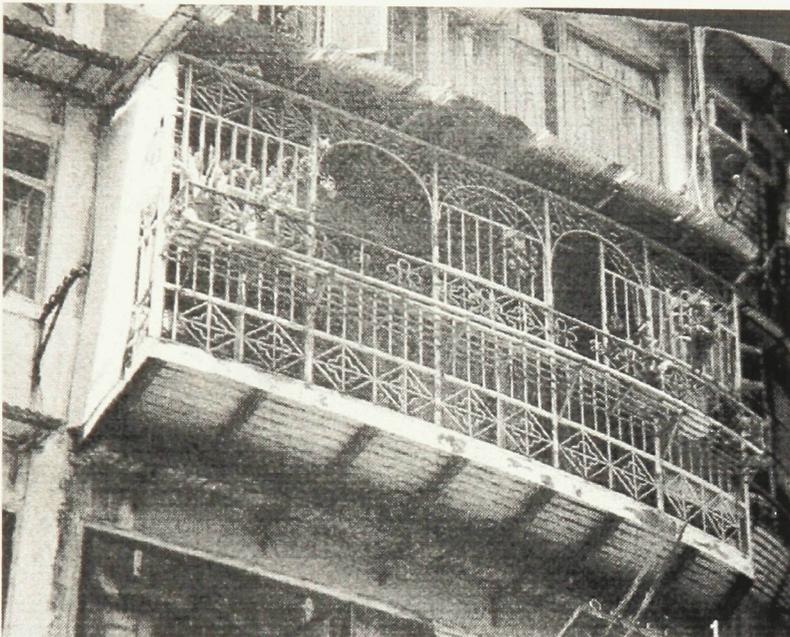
A 'metal cabin' attached onto the prefabricated façade wall.
